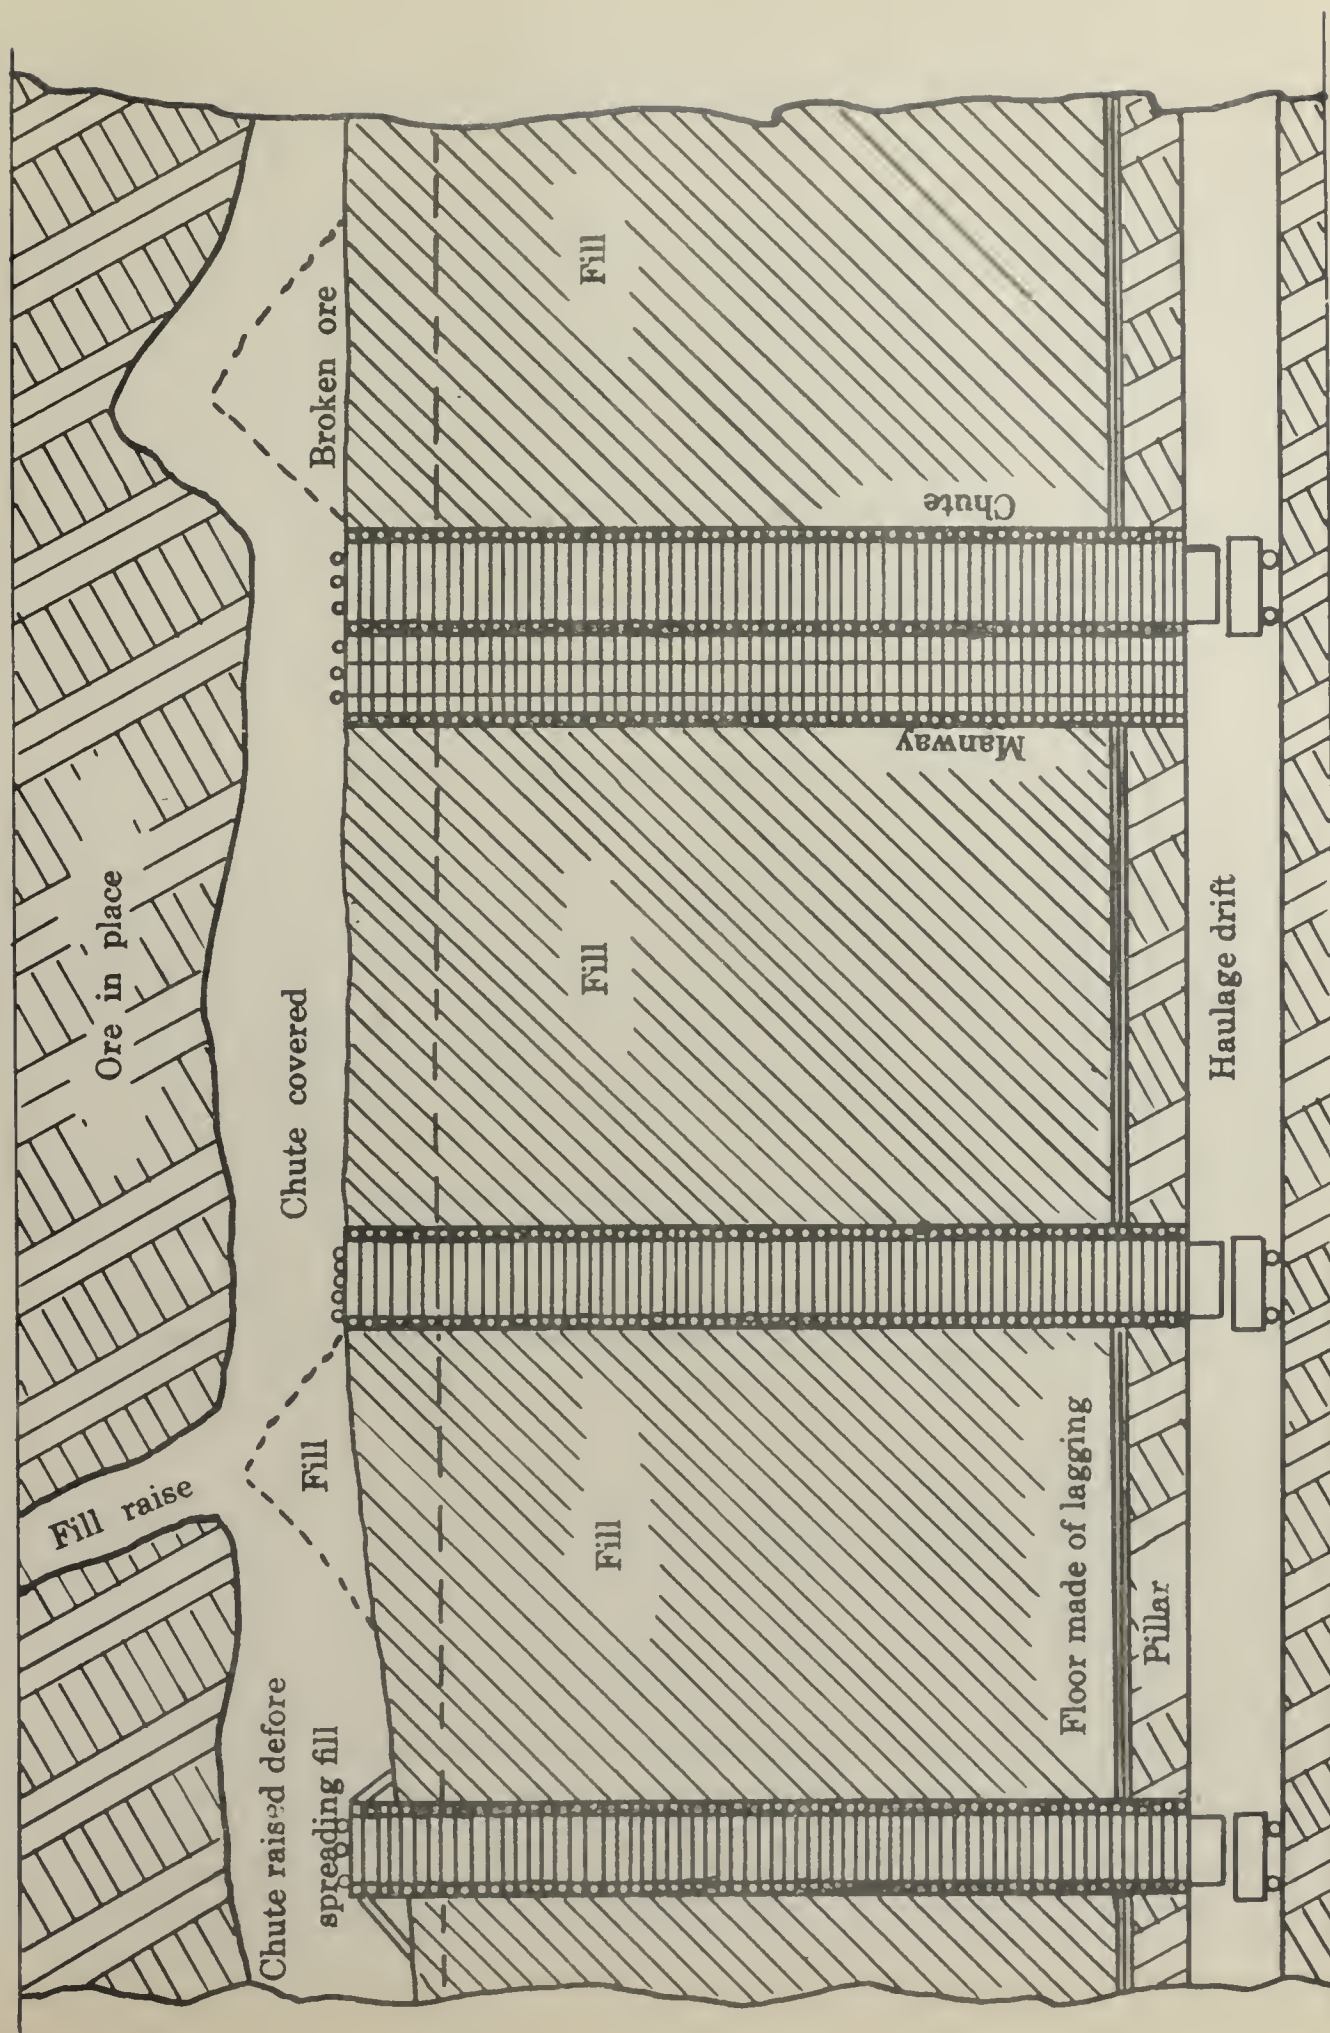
Longitudinal section through stope, showing cut-and-fill mining. Not drawn to scale
